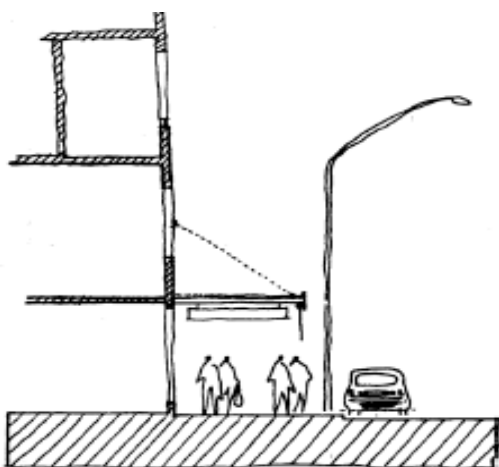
Awning must be a cantilevered steel box section that steps with the slope of the street.
